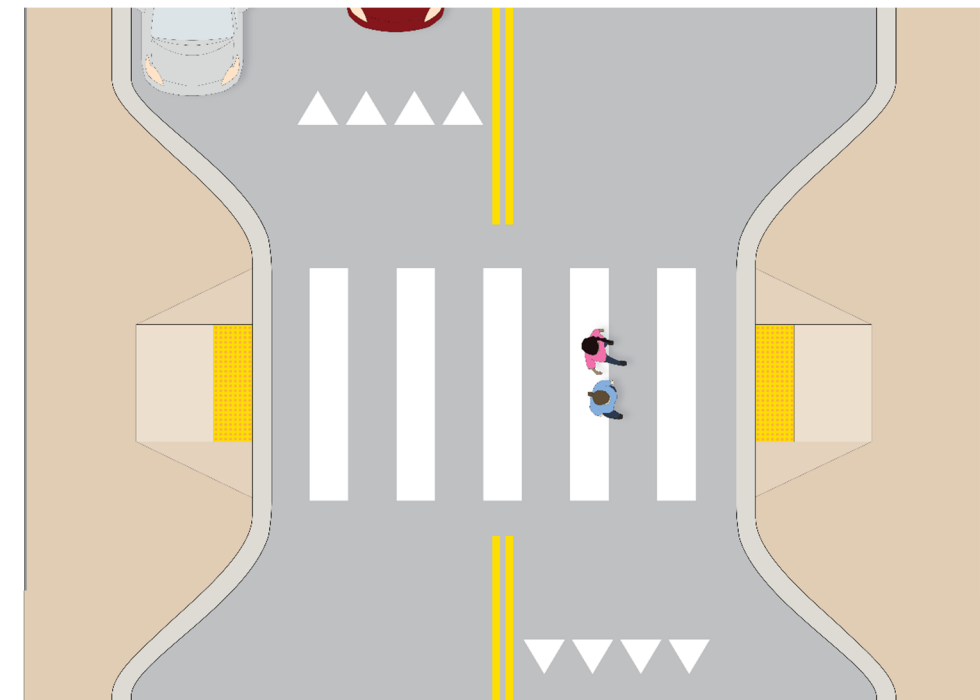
MID-BLOCK CROSSWALK PLAN VIEW
